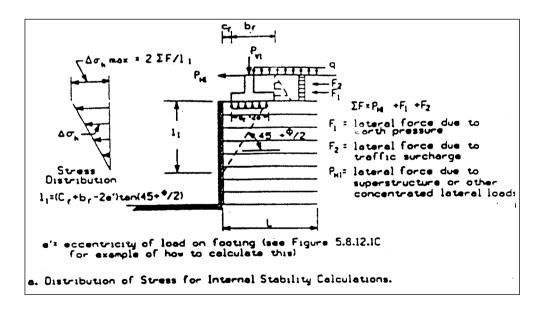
DISTRIBUTION OF TRAFFIC IMPACT LOAD TO THE UPPER LAYERS OF THE REINFORCEMENTS [2]
